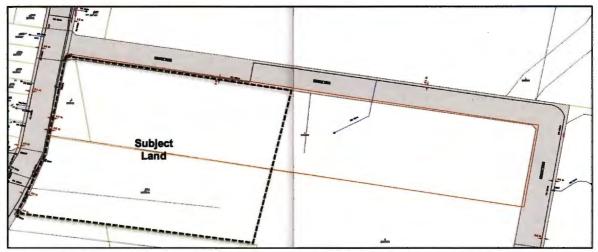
Existing Gas Reticulation Network (Source: APA/XP 2017)
